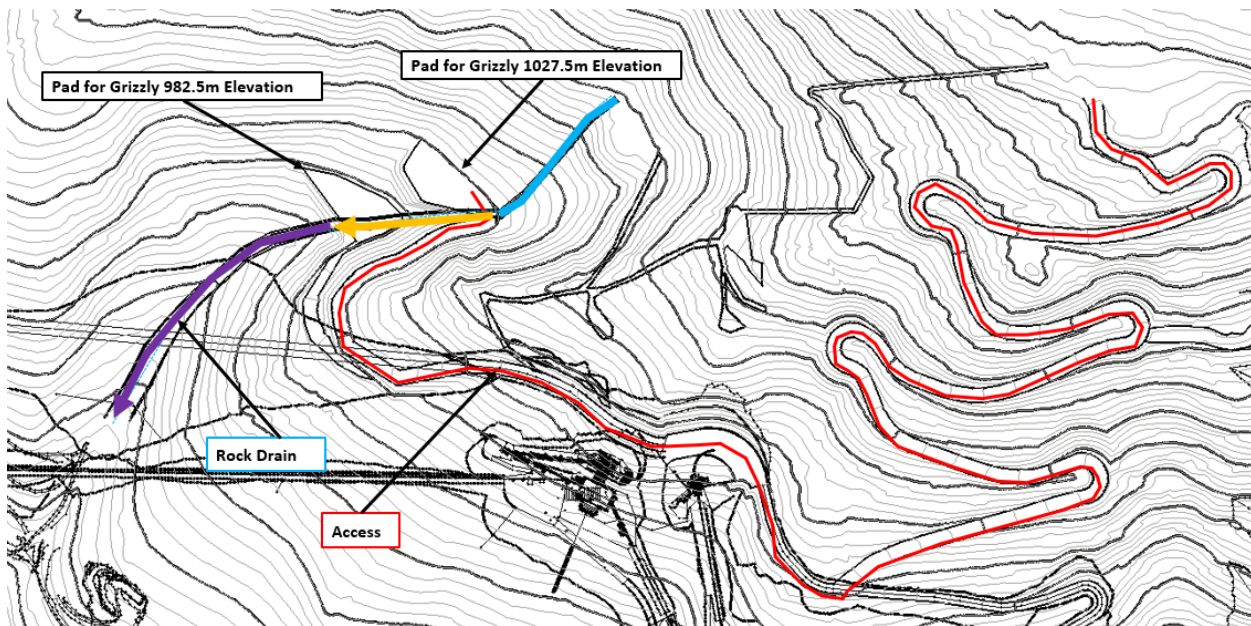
Eagle Pup WRSA Rock Drain Construction Phase 2 - 1,027.5 masl Elevation
